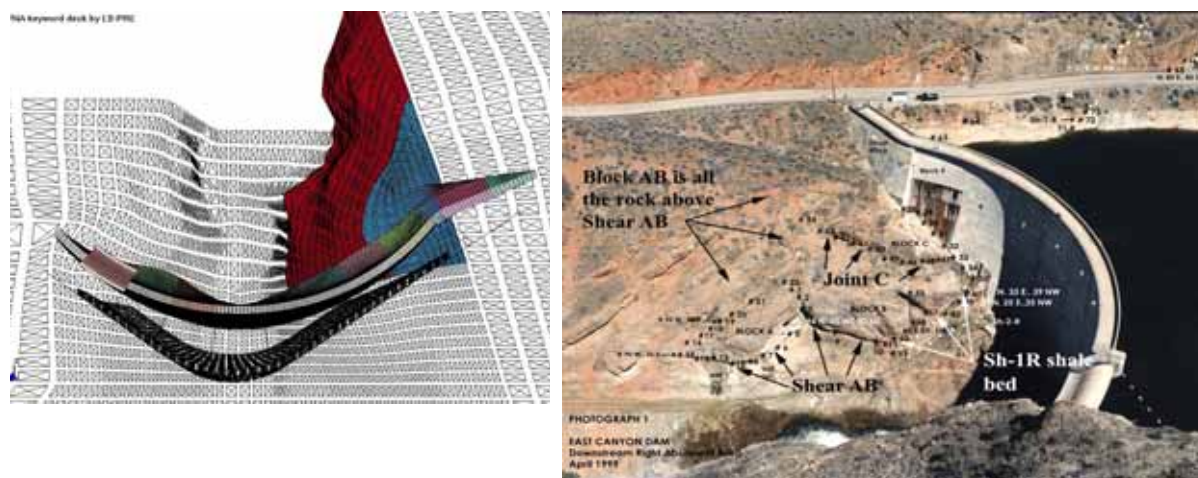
Finite element model of thin arch dam with foundation block and photograph of the dam and foundation
